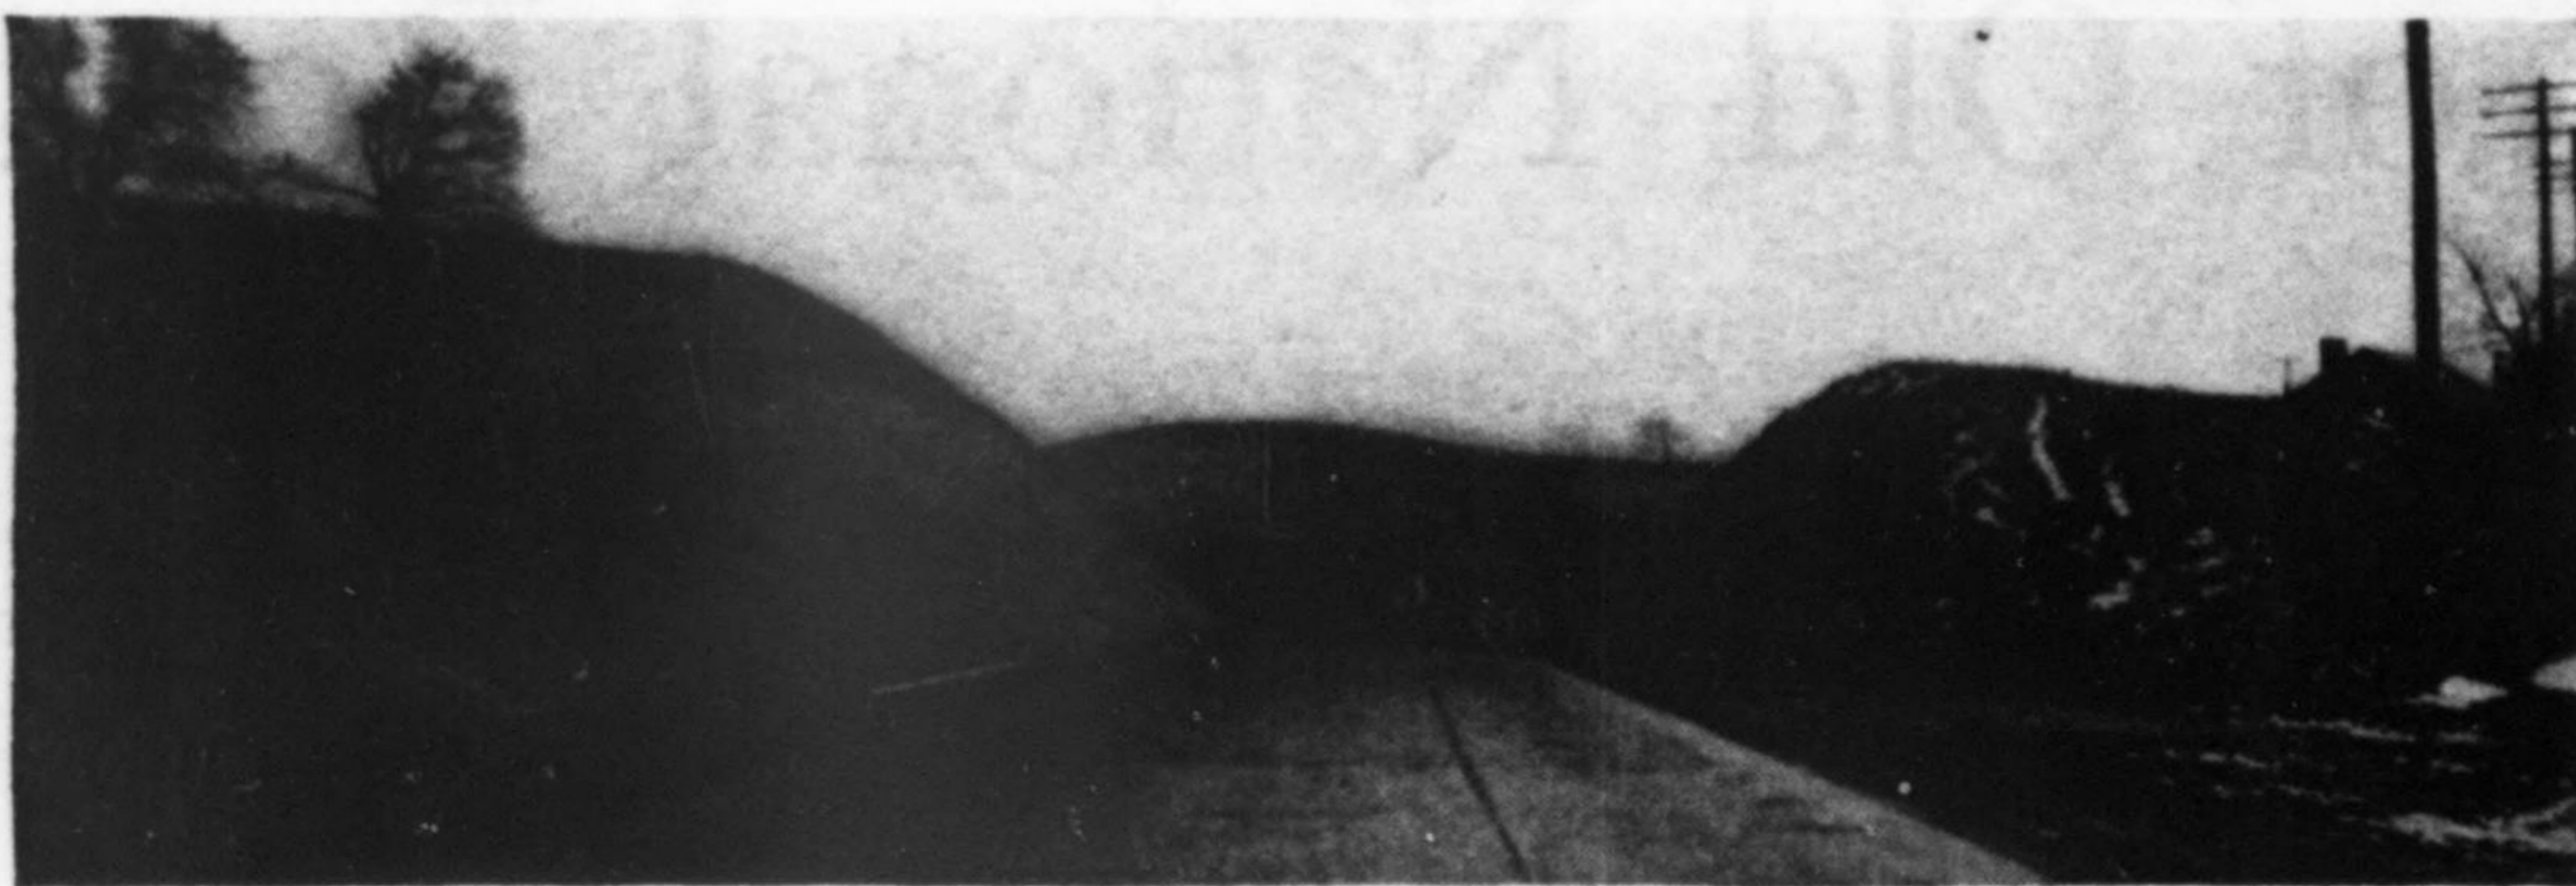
CUT AT TOP OF HILL at west end of relocation, showing new concrete pavement.
